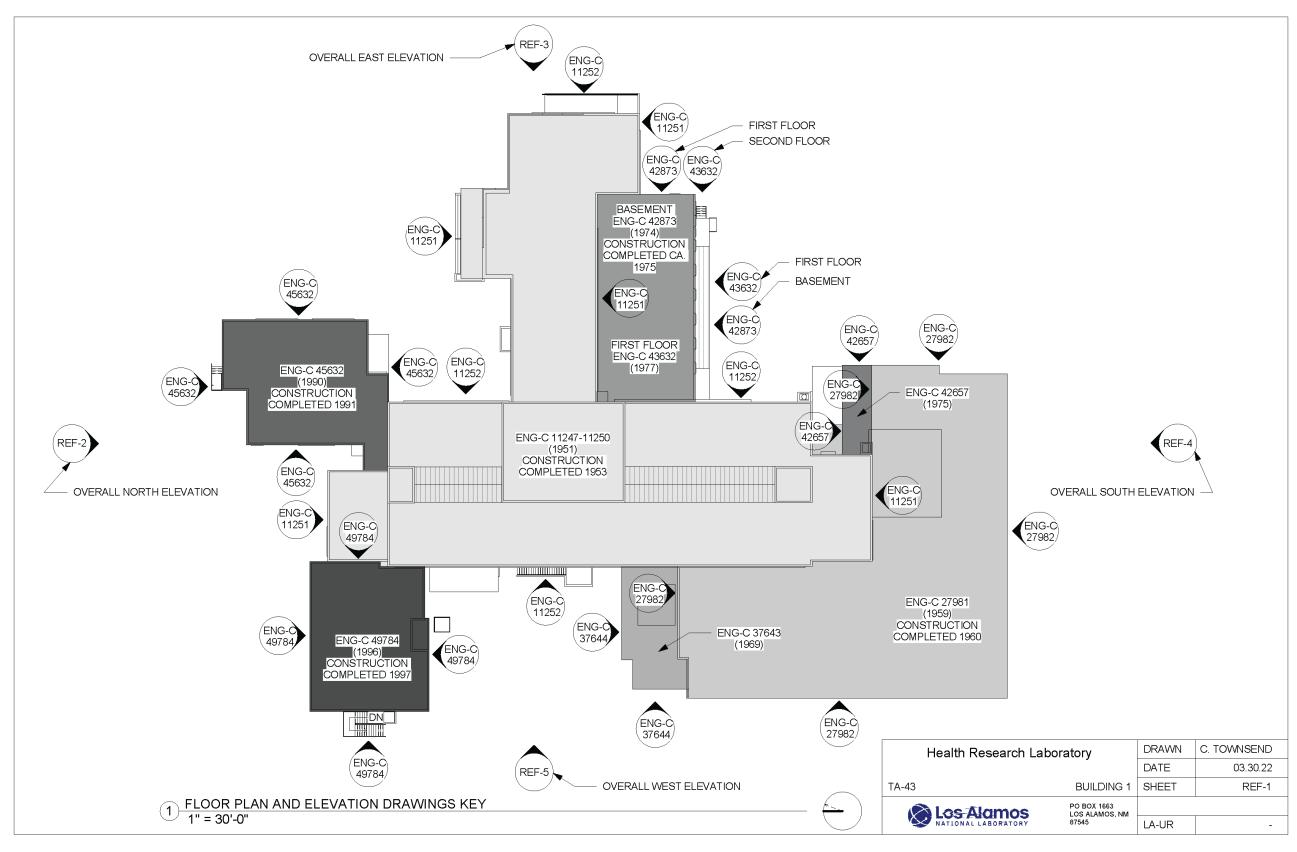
Health Research Laboratory, TA-43-0001, Floor Plan and Elevation Drawings Key.
